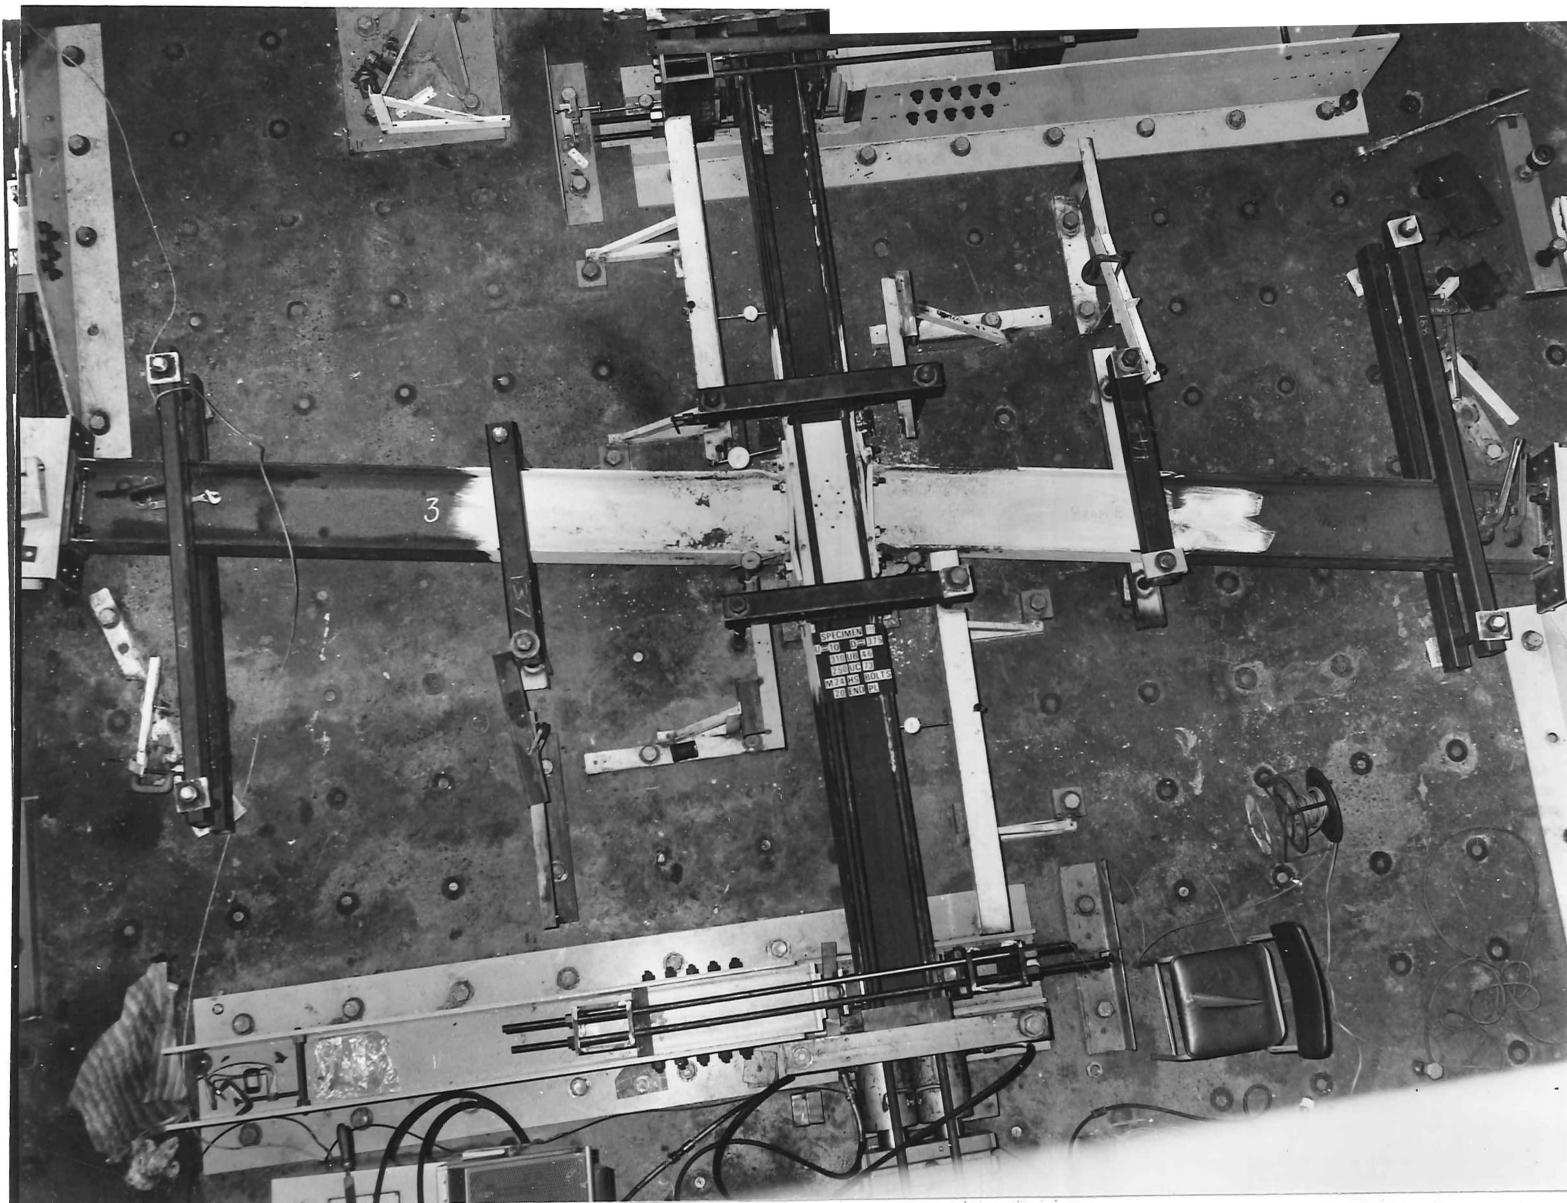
General view of specimen three after the test showing additional beam bracing. c.f. Fig. 4.3 8
